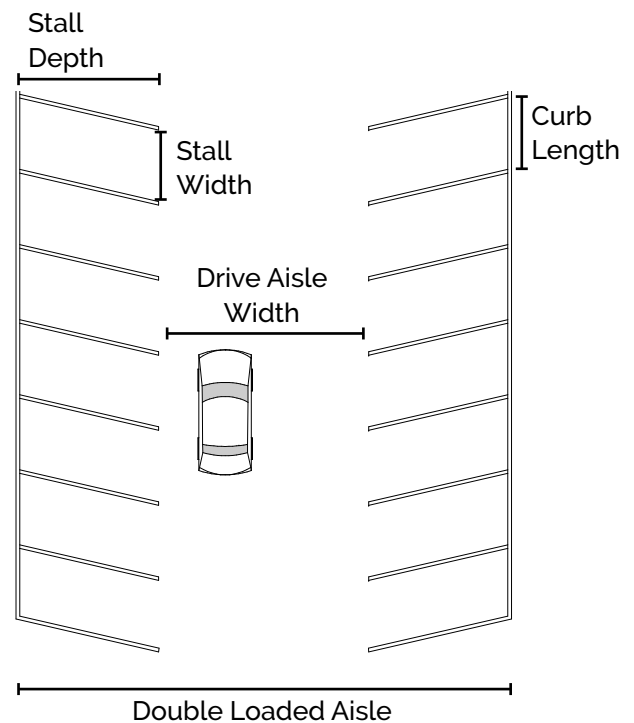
Parking Space and Drive Aisle Dimensions.
